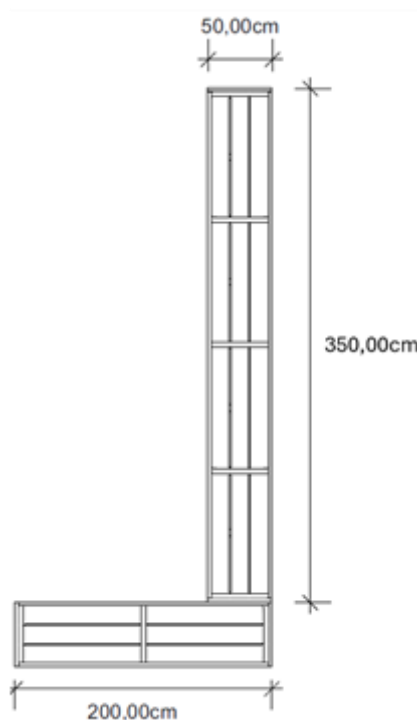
Plan trough plan view (with floorboards) (Source: Dipl.-Ing. Ralf Dophiede e.U.)
